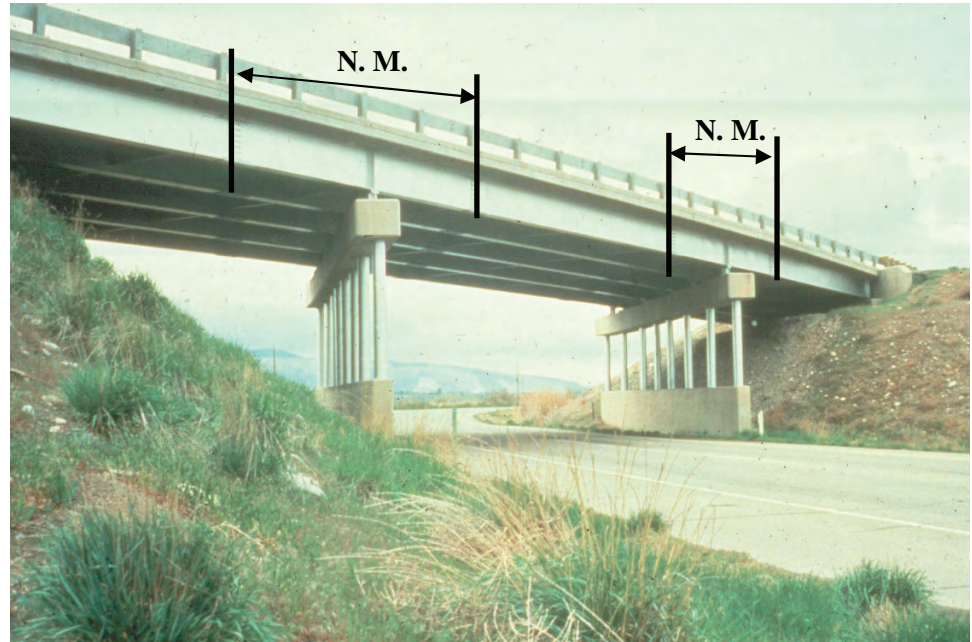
Flexural Zone on a Simple Rolled Multi-beam Bridge is Entire Length of Beams Between Supports
